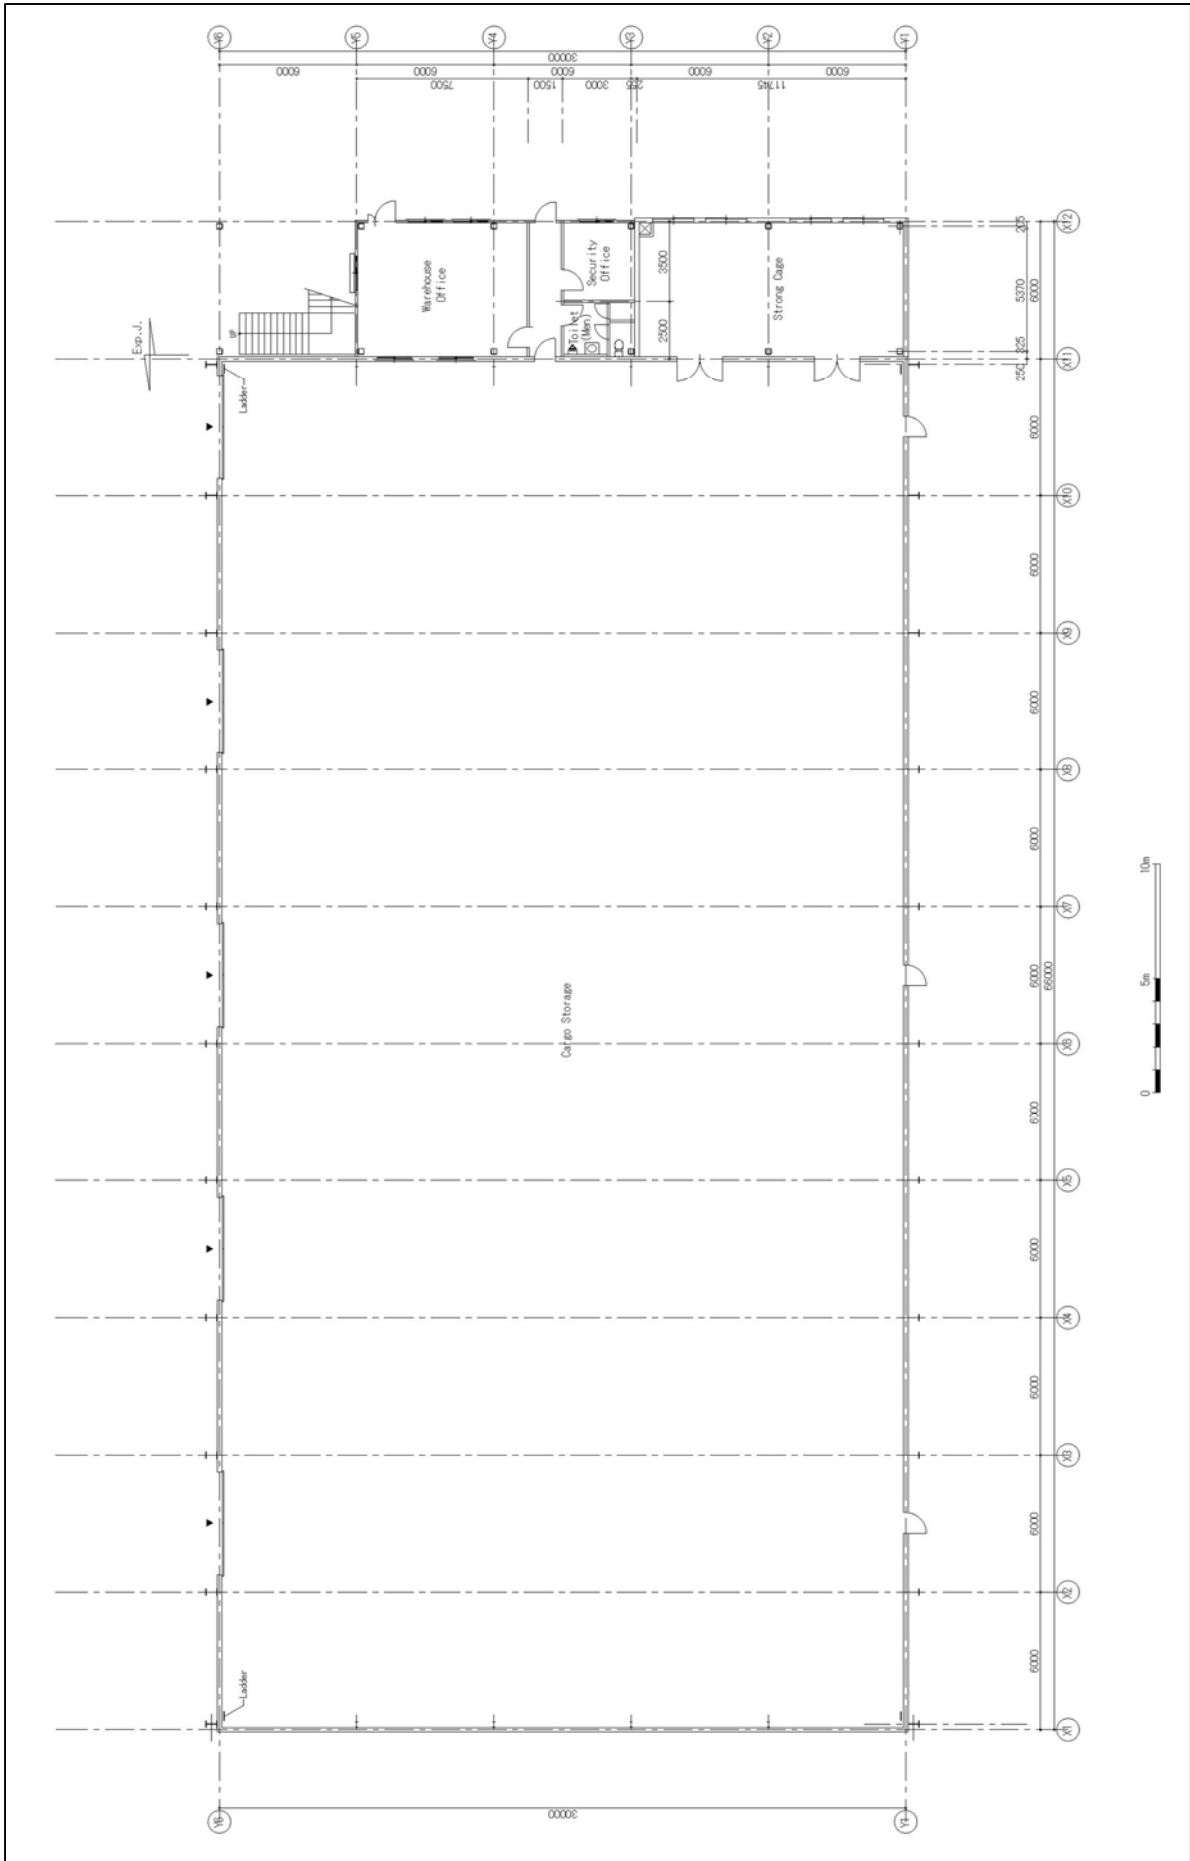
Layout Plan of (New) General Cargo Warehouse (GF)
